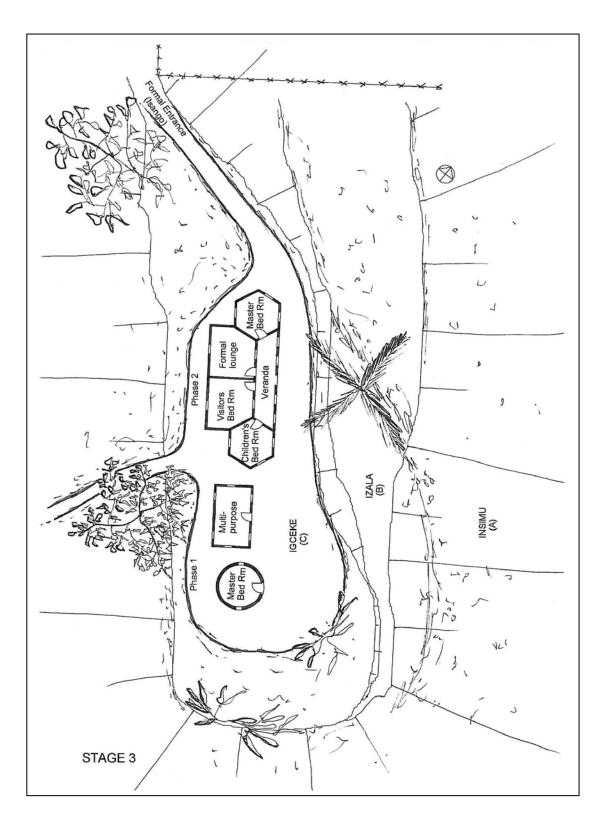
Addition of a composite modern building that maintains the traditional concept shown in fig.4.6.
